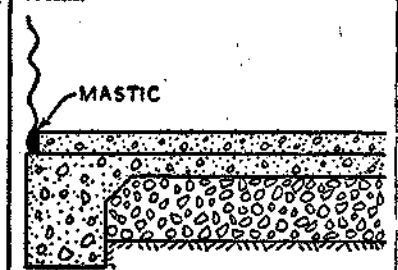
Place a 2-in. concrete topping with mastic joint against the side walls to eliminate seepage difficulties when the concrete platform is wider than the bin.
